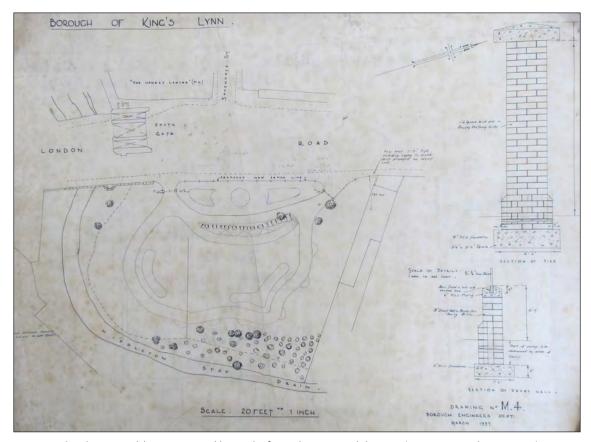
A plan (presumably a proposed layout) of Southgates Park by King's Lyn Borough Engineer's Department dated March 1937. On the right is a drawing of a gatepier. King's Lynn Borough Archives KL-SE1-PW4 (2)
